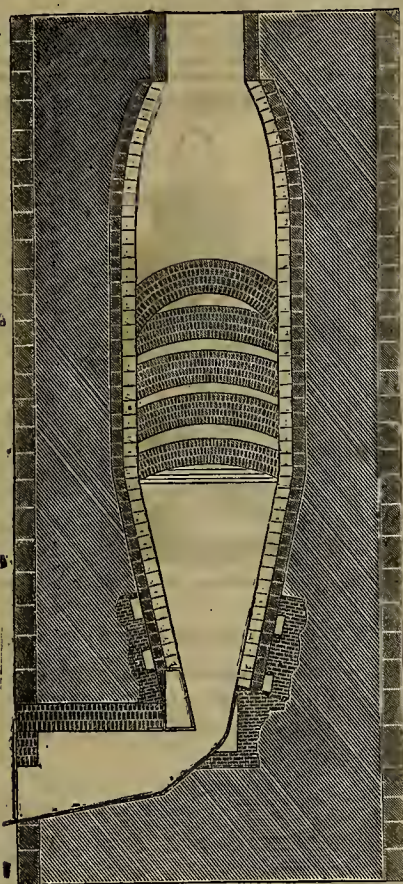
Cross Section of Furnace, Walls and Vapor Way Arches.
